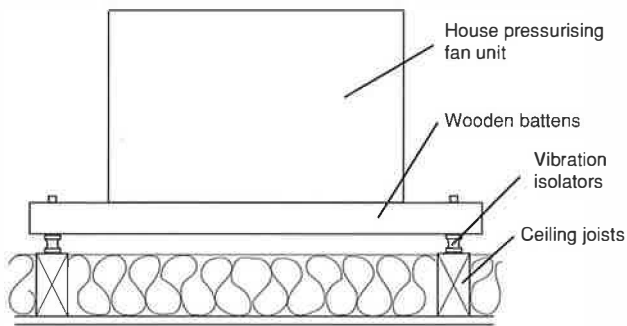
Mounting of fan unit on ceiling joists (typical arrangement)
